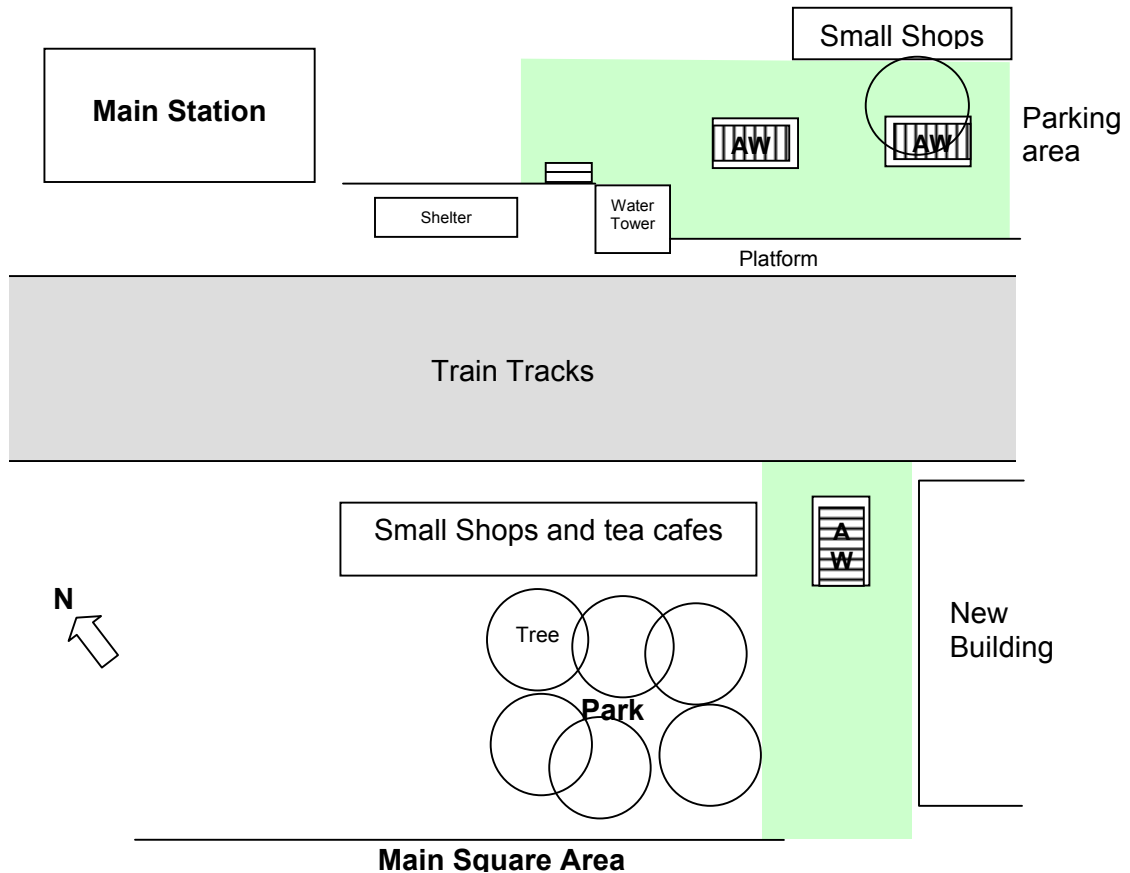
General site layout and suggested landscaping around Accessways (AW)
